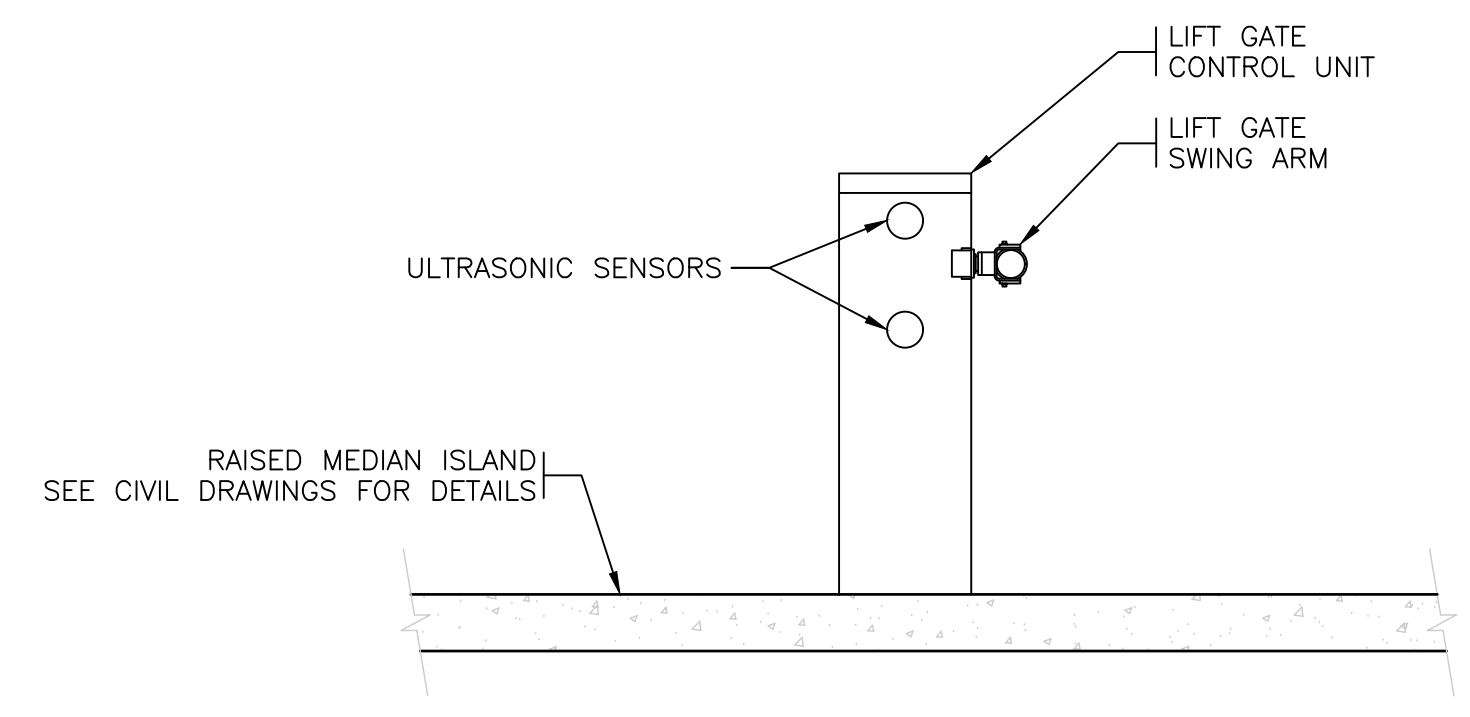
Z8 - LIFT GATE TYPICAL LAYOUT 1:20
